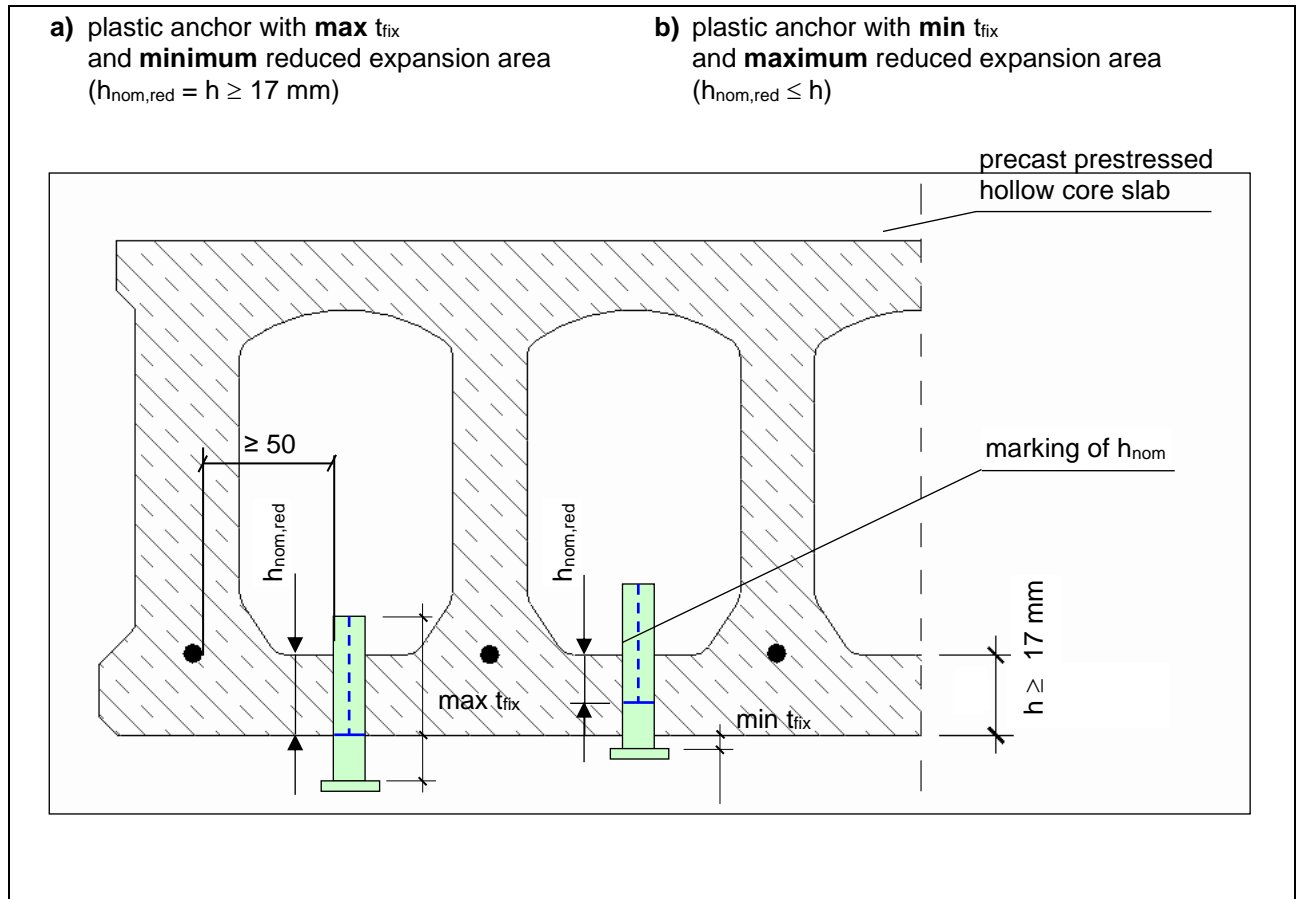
Example for different setting positions of plastic anchors in precast prestressed hollow core slabs
